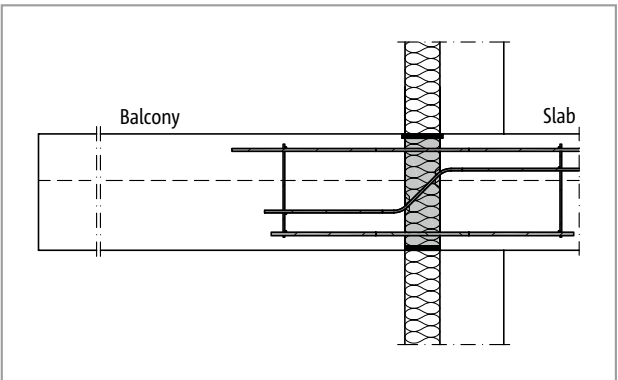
Schöck Isokorb® XT type B: Balcony construction with freely cantilevered downstand beams
